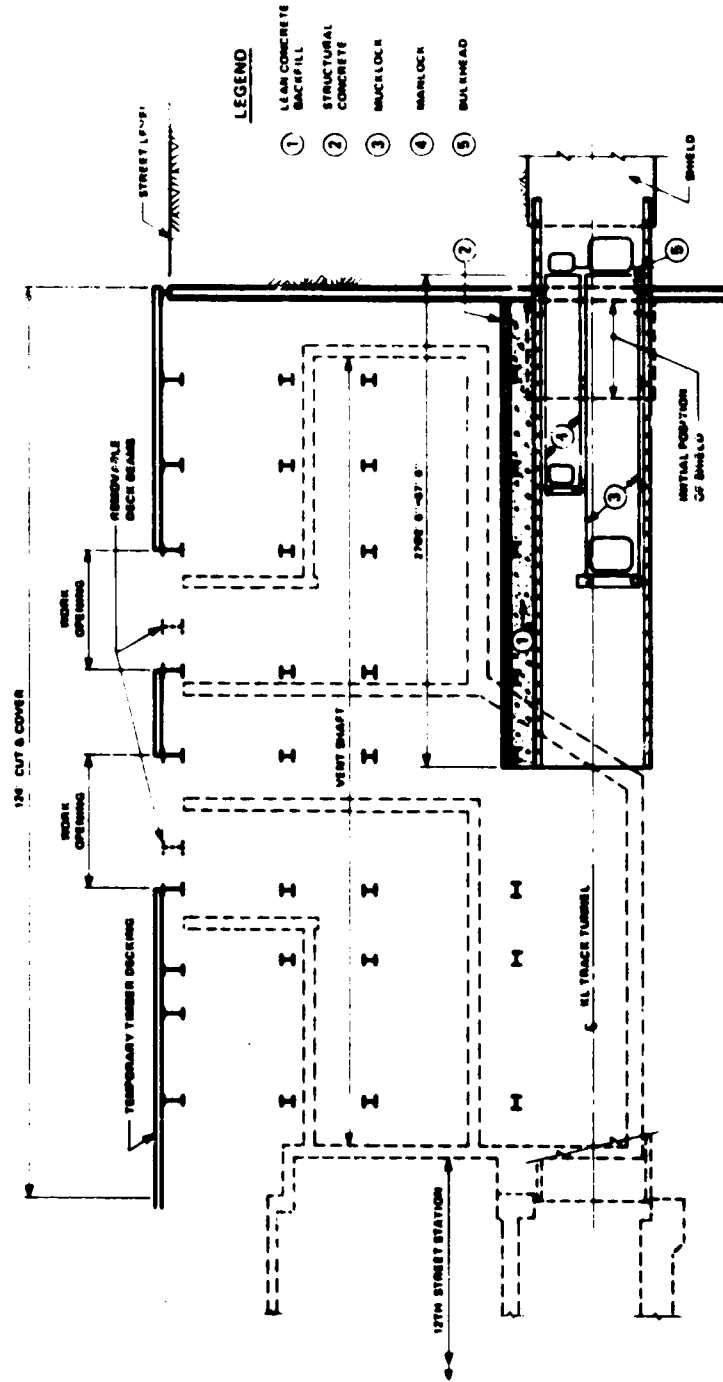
BART Project K0016, Twelfth Street Station and Line, Oakland - Tunnel Workshaft Plan
